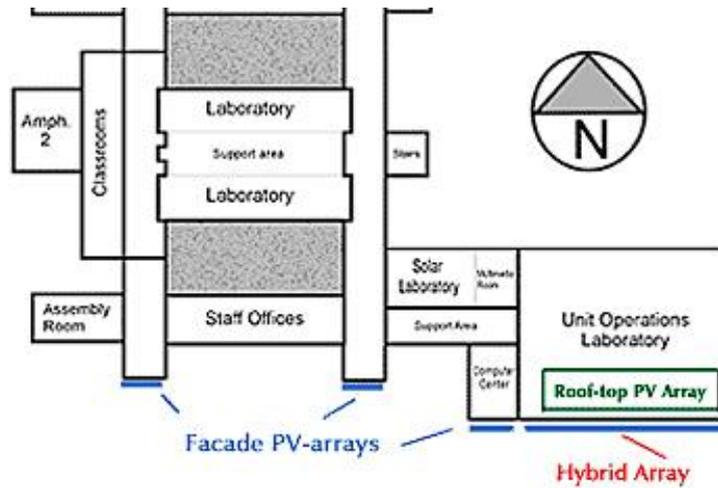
Ground plan of Chemical Engineering Building where PV arrays are placed
